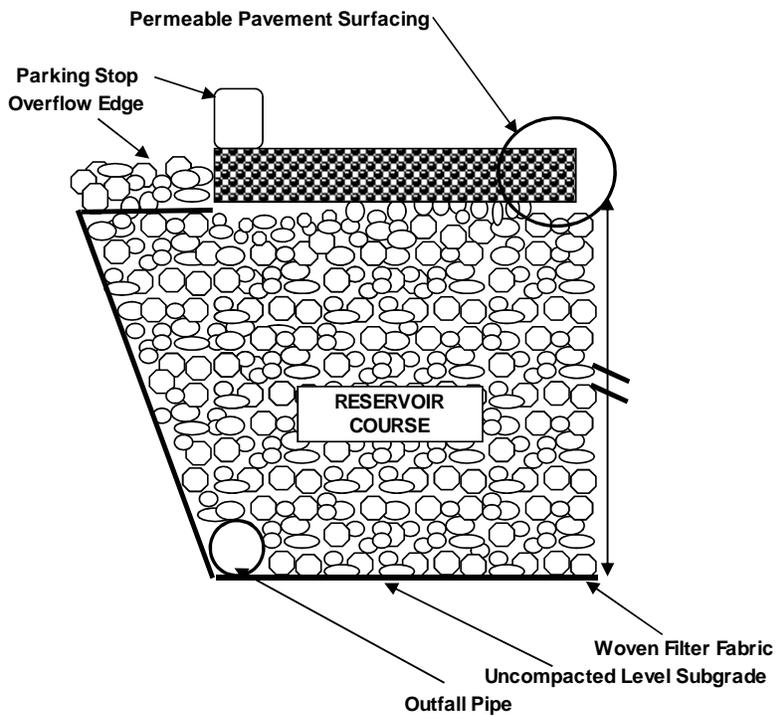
Typical Partial infiltration Porous Pavement Section with Subdrain System
